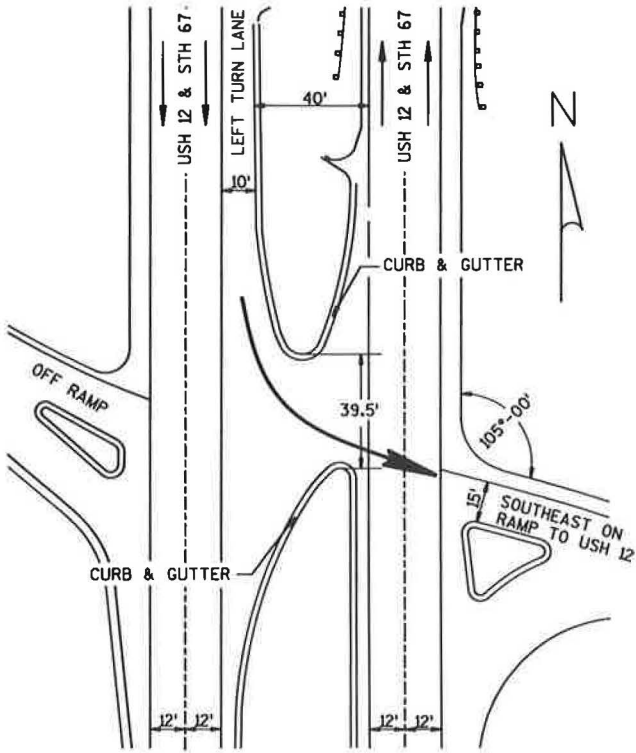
US-12 and WI-67, Elkhorn intersection.
